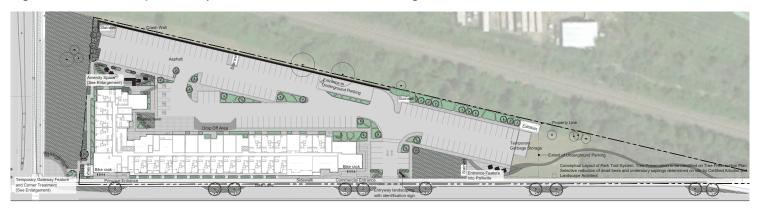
Preliminary Landscape Plan - Whitehouse Urban Design Inc.
